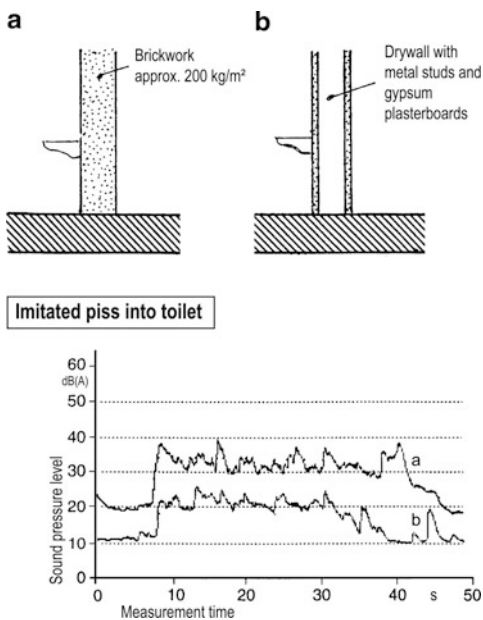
Installation noise in the room diagonally below the bathroom for imitated pissing water. (a) wall-mounted toilet at massive wall (b) wall-mounted toilet at dry wall with light gypsum boards
